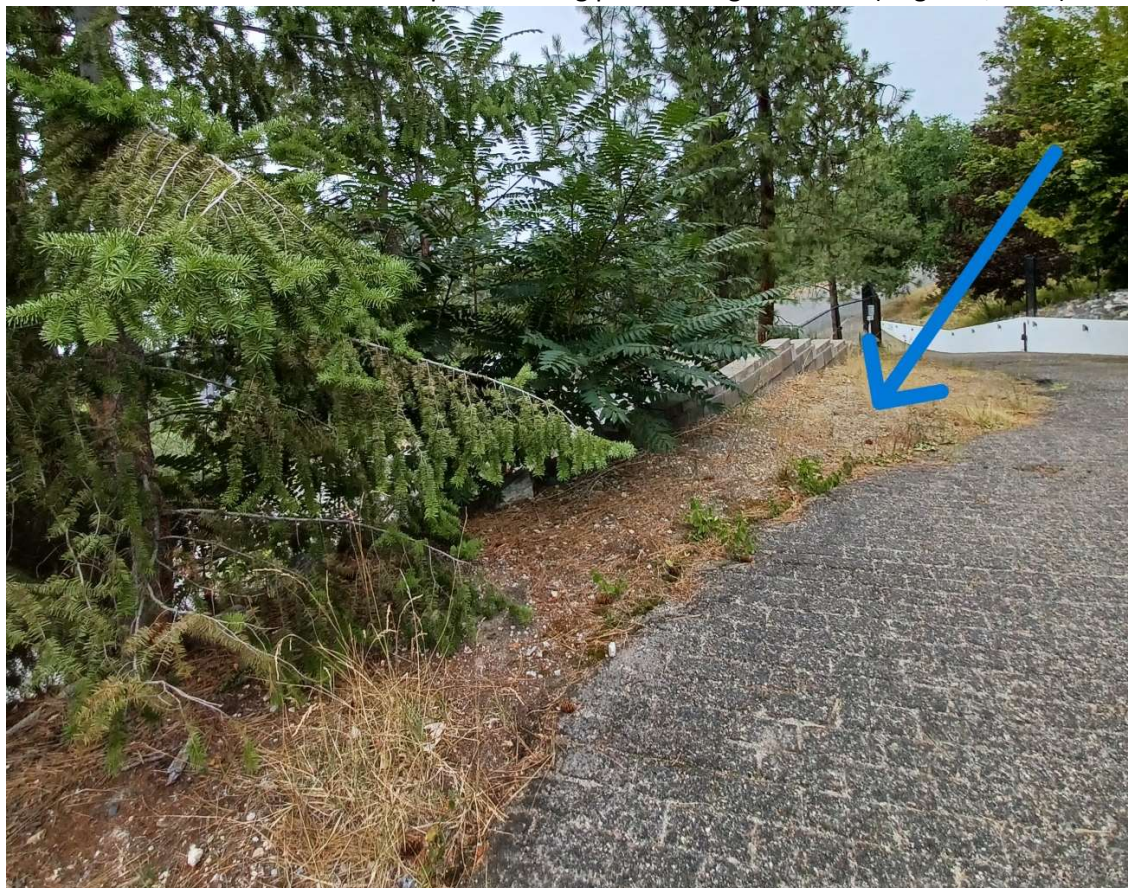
Area for the driveway extension, looking west (August 9, 2023).
